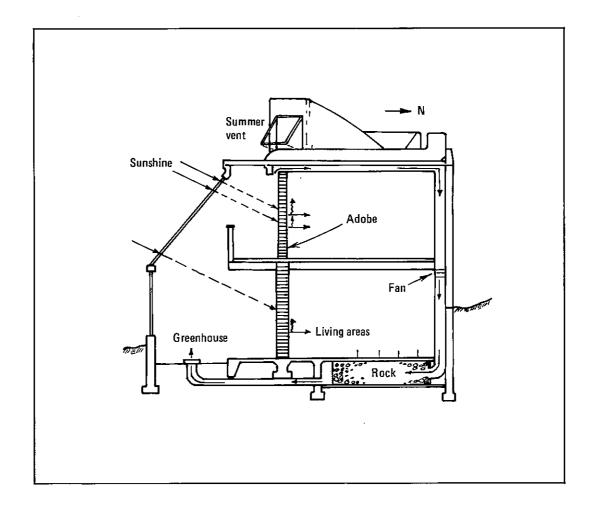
Example of section through a passive building with an attached greenhouse. (Section 3)
